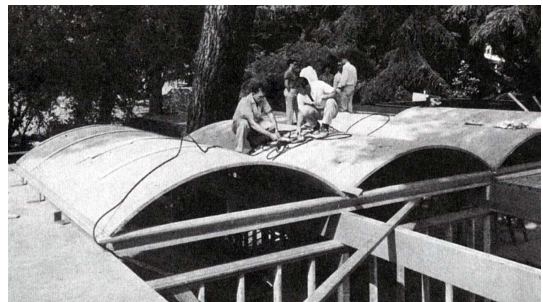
Case Study House #20 Roof Panel Construction, Buff, Straub & Hensman, (1958)
